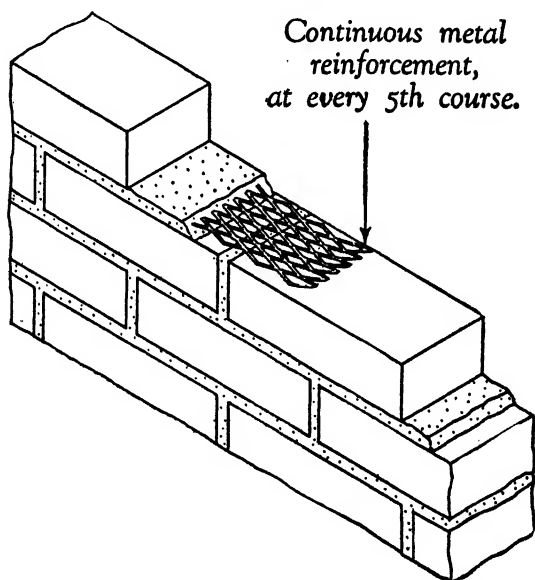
Method of reinforcing 4-in. wall construction for lateral strength, using welded wire mesh, strips of metal lath or light rods.
